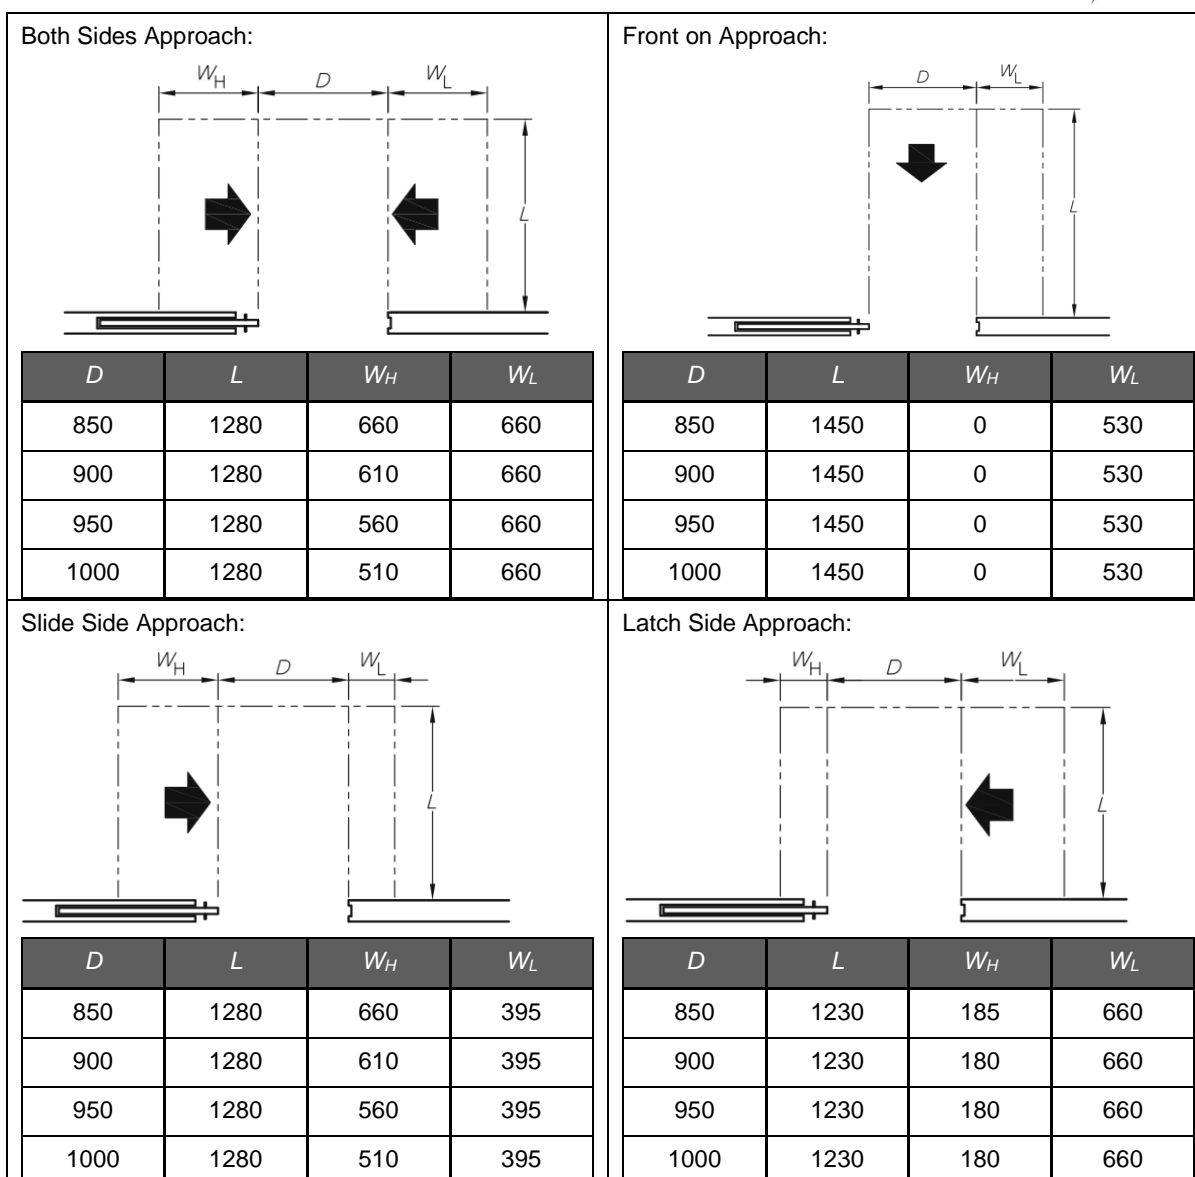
Circulation Space at Sliding Doors – Recessed in Wall
